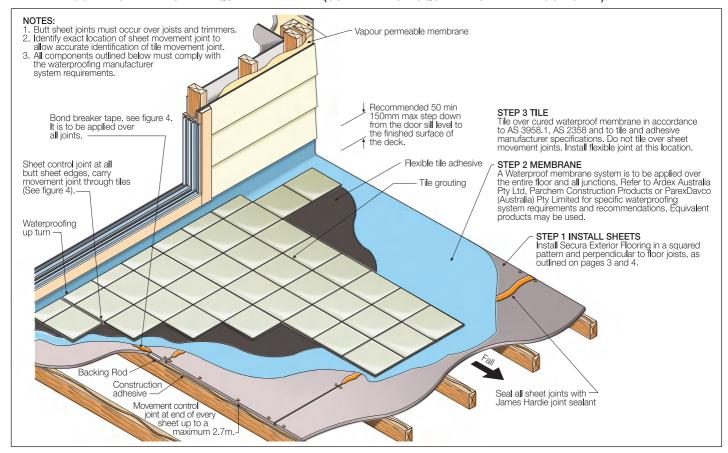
METHOD 1 - SYSTEM INSTALLATION
